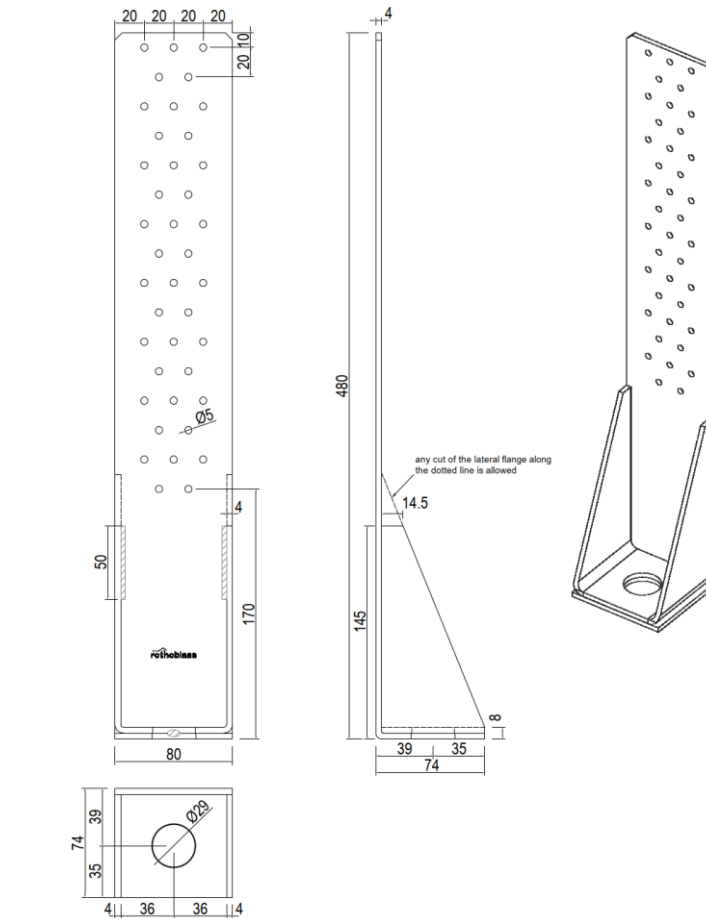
Dimensions of Rotho Blaas WHT40 hold downs.
